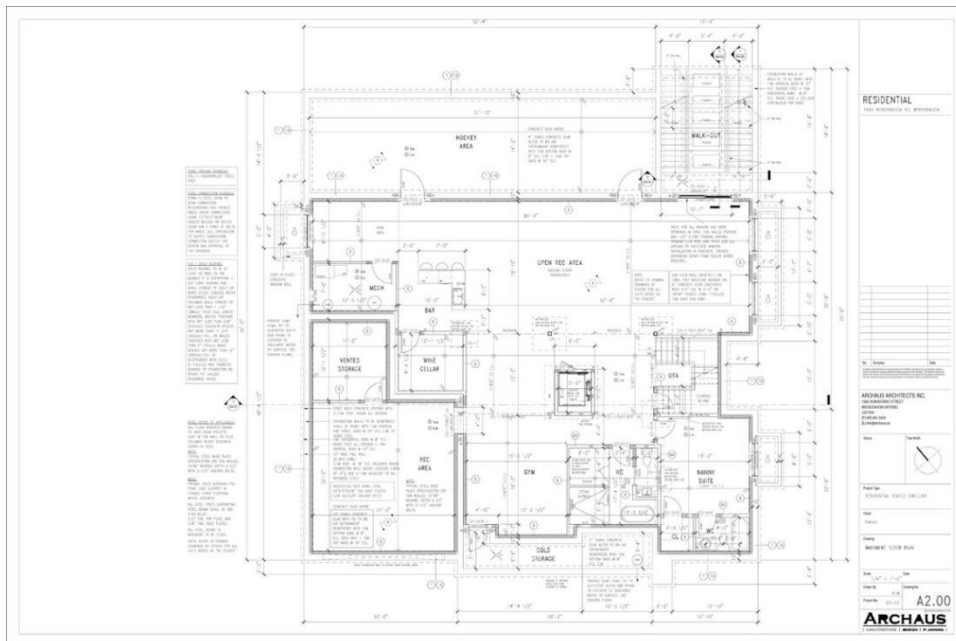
Basement Floor Plan, Archaus, (APPENDIX III)
